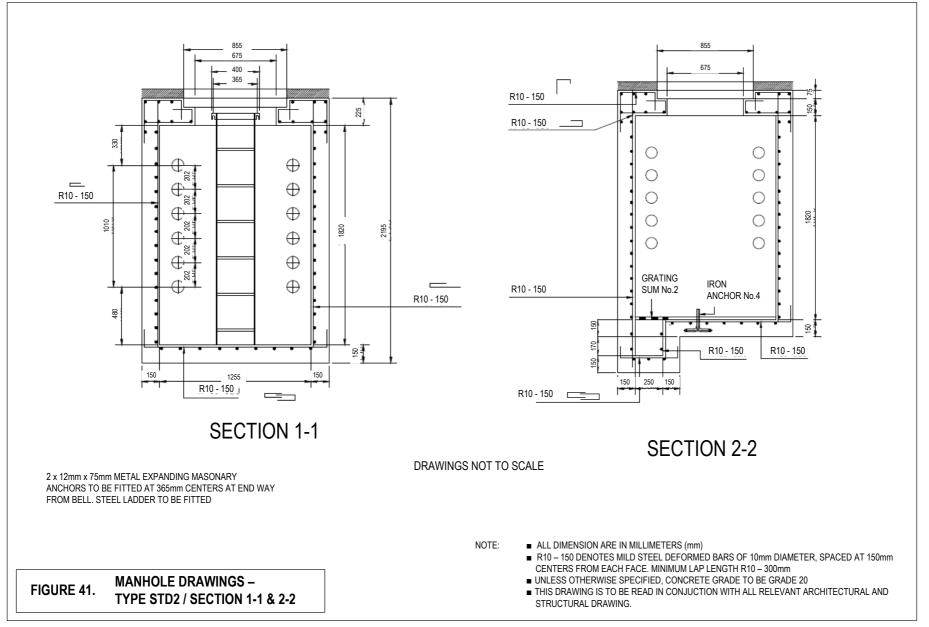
Manhole drawings details – Type STD2 / section 1-1 and 2-2
